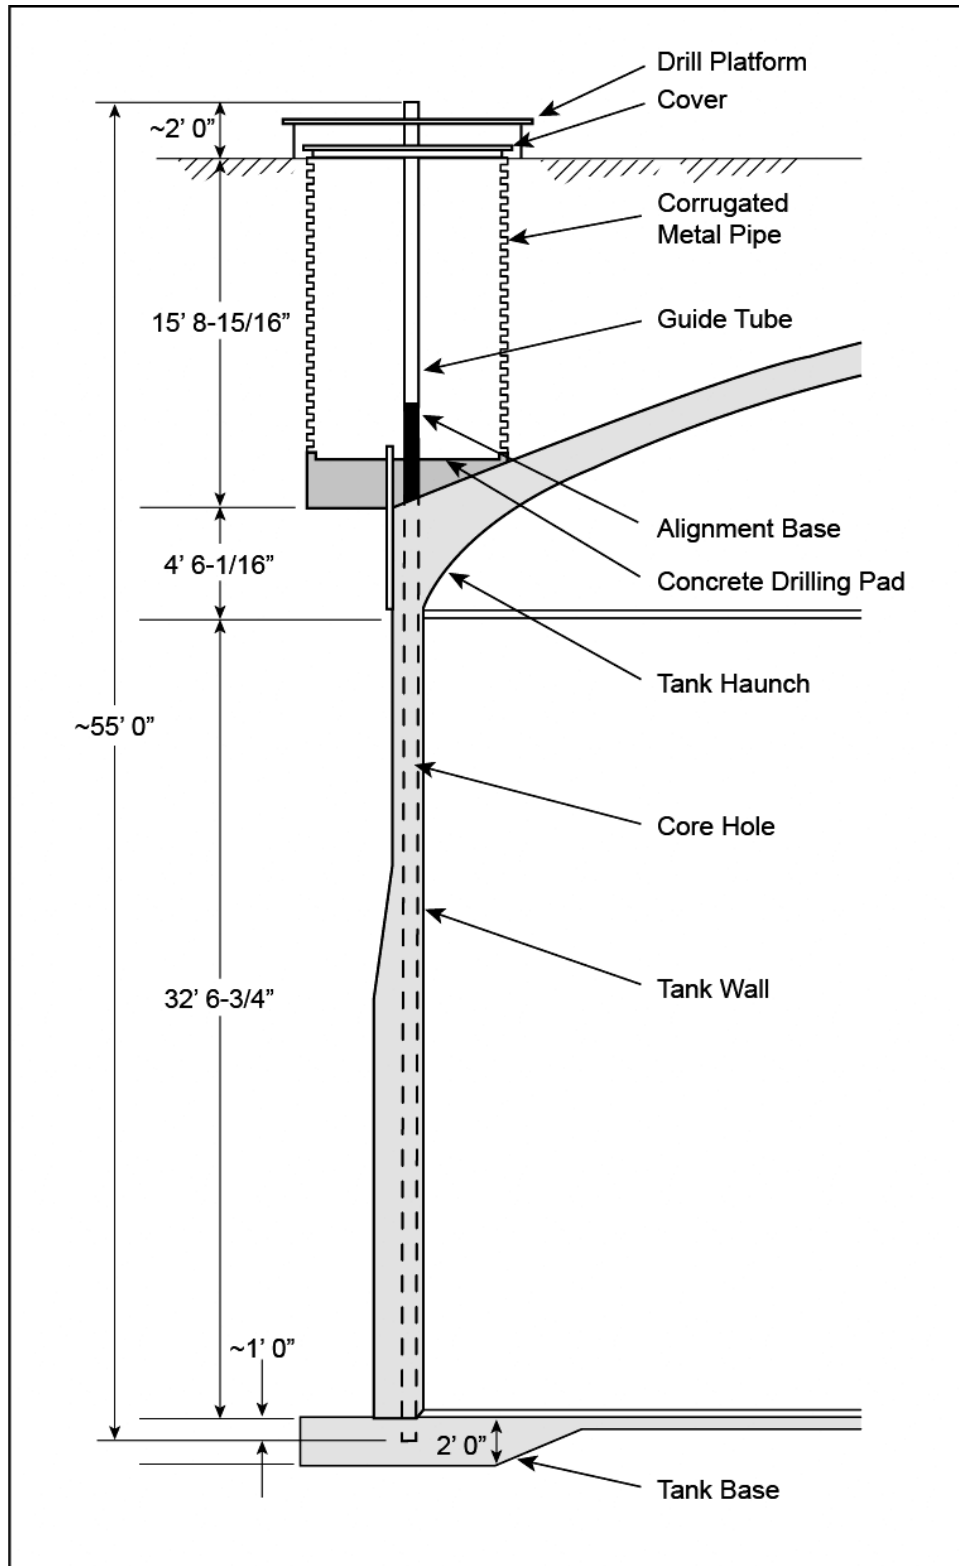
Core Hole Configuration with Guide Tube (RPP-49300)
